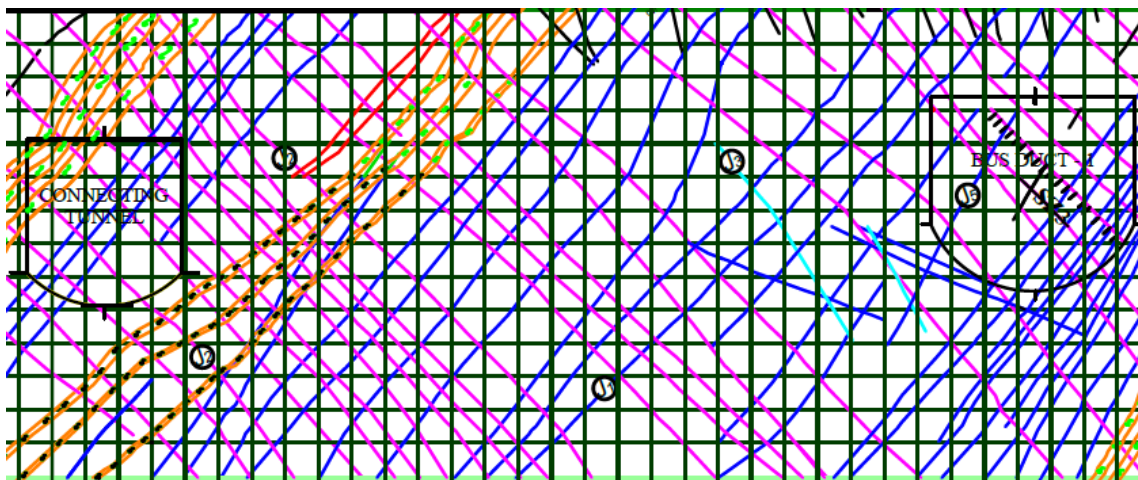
Geological log downstream wall of the machine hall between connecting tunnel and Bus-duct-1
